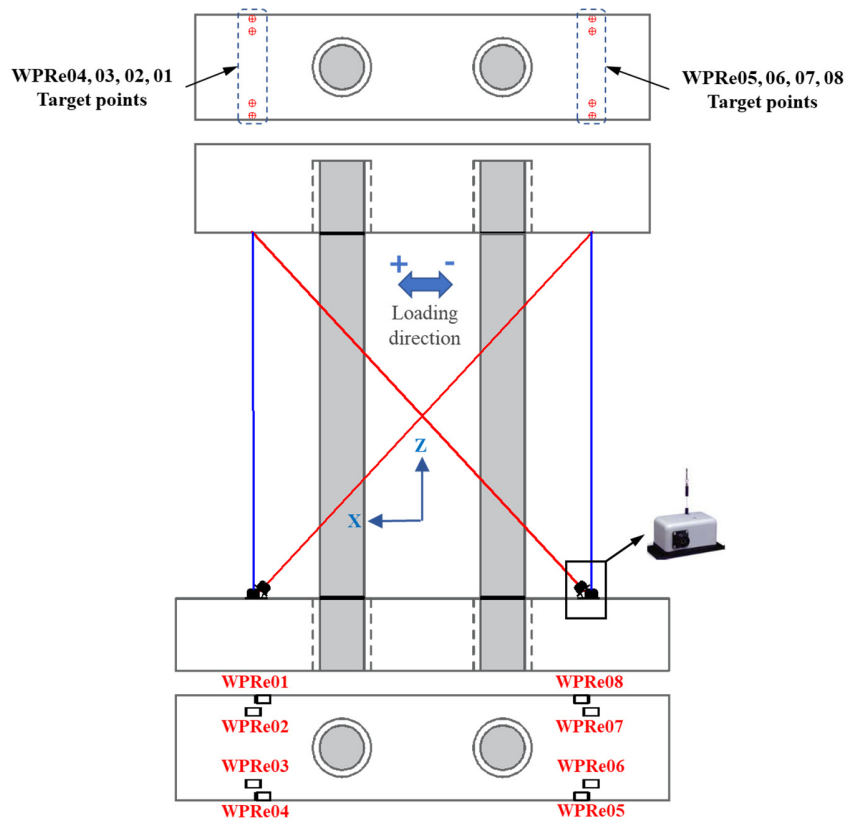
Layout of WPs between the two end members (cap beam and foundation).
